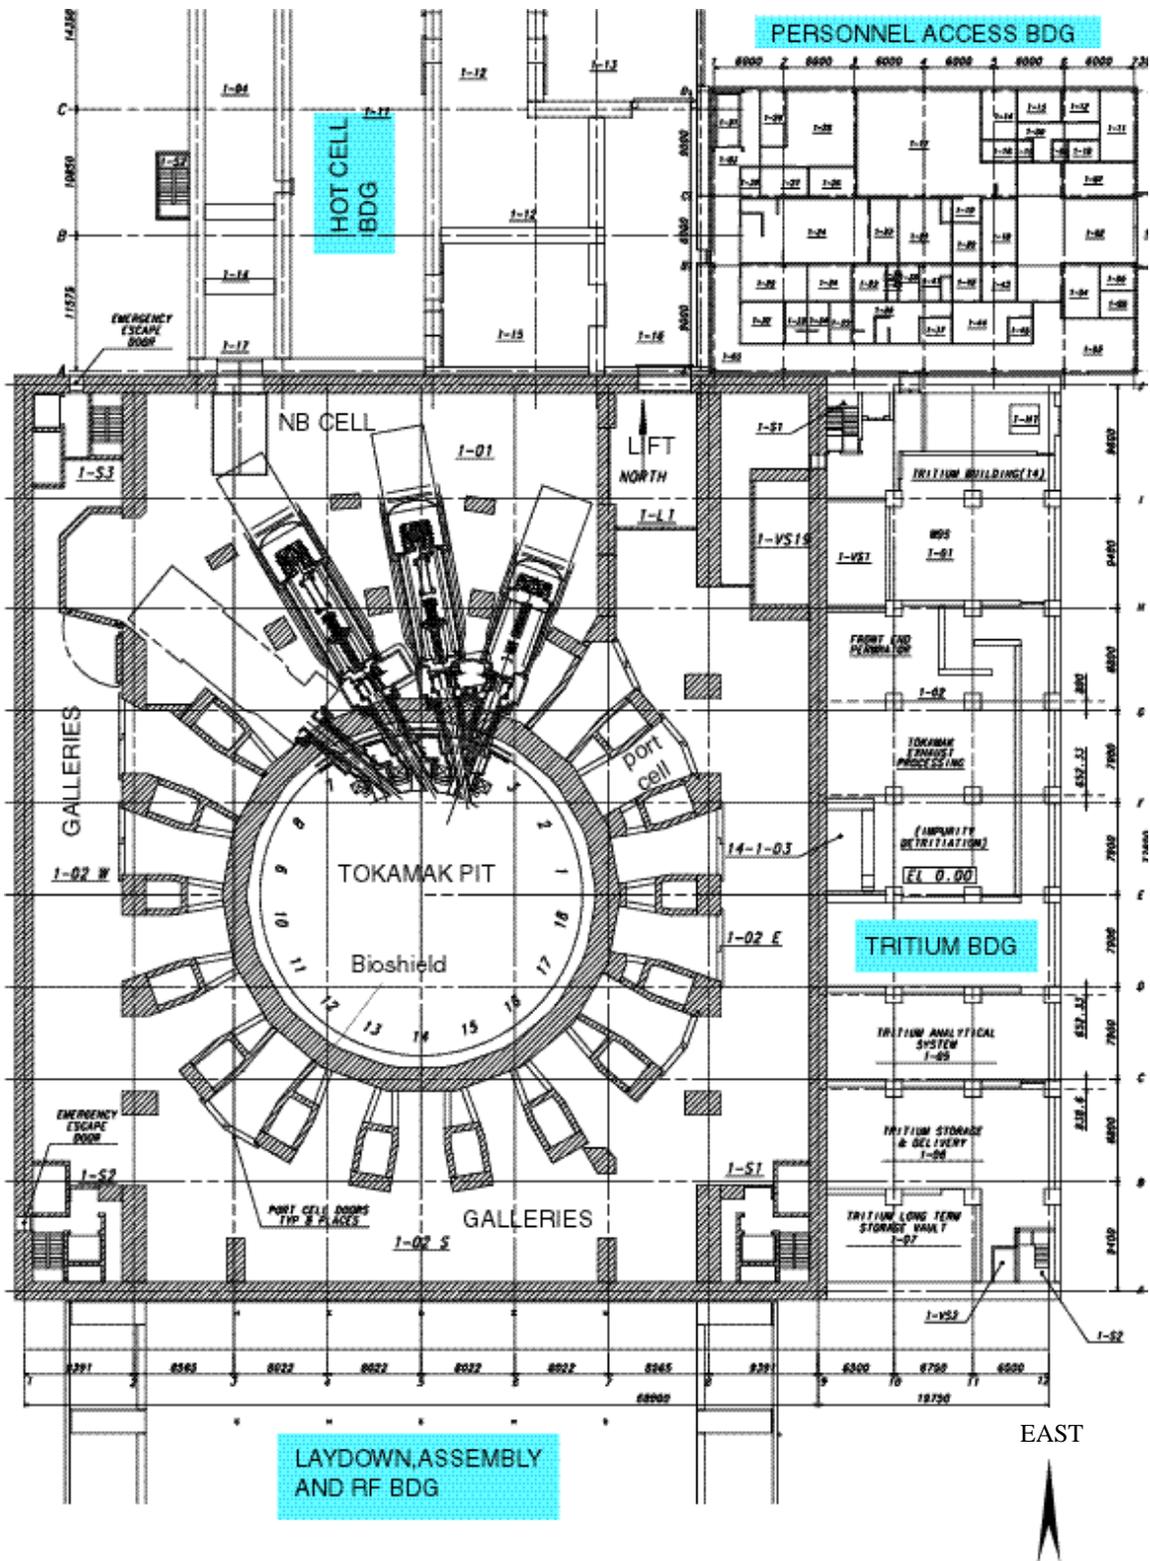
Tokamak Building – Plan View of the Equatorial Level
